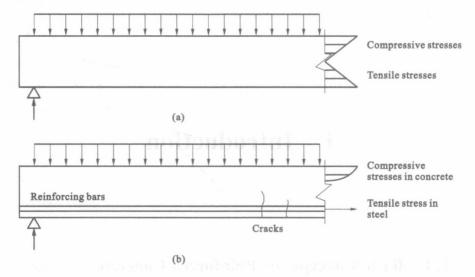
Behaviour of unreinforced and reinforced concrete beams
